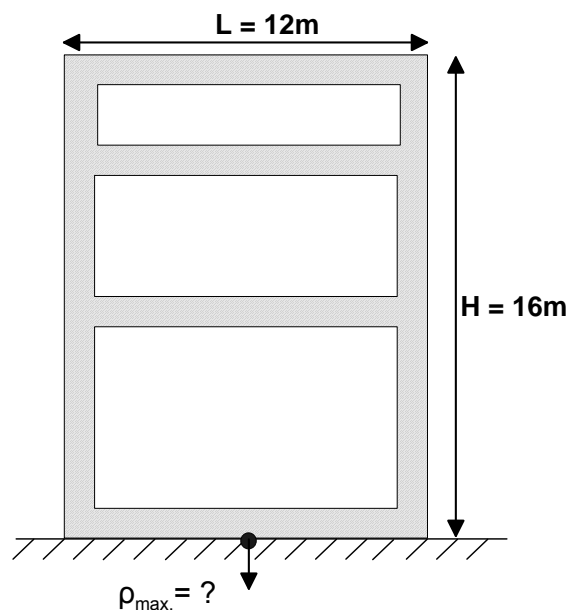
Ordinary building resting on a (flexible or rigid) raft foundation.
